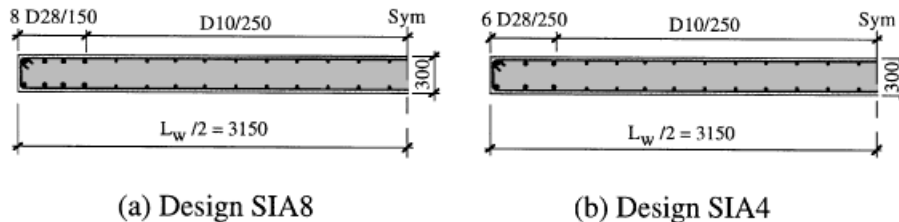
Details of cross-sections at the base of the walls designed according to SIA 160
